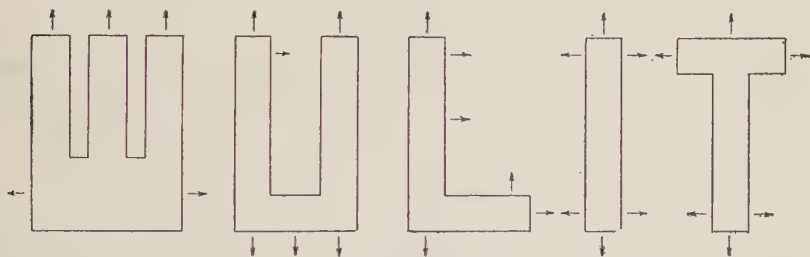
Ground Plans of Factory Buildings Indicating Possible Directions of Expansion
